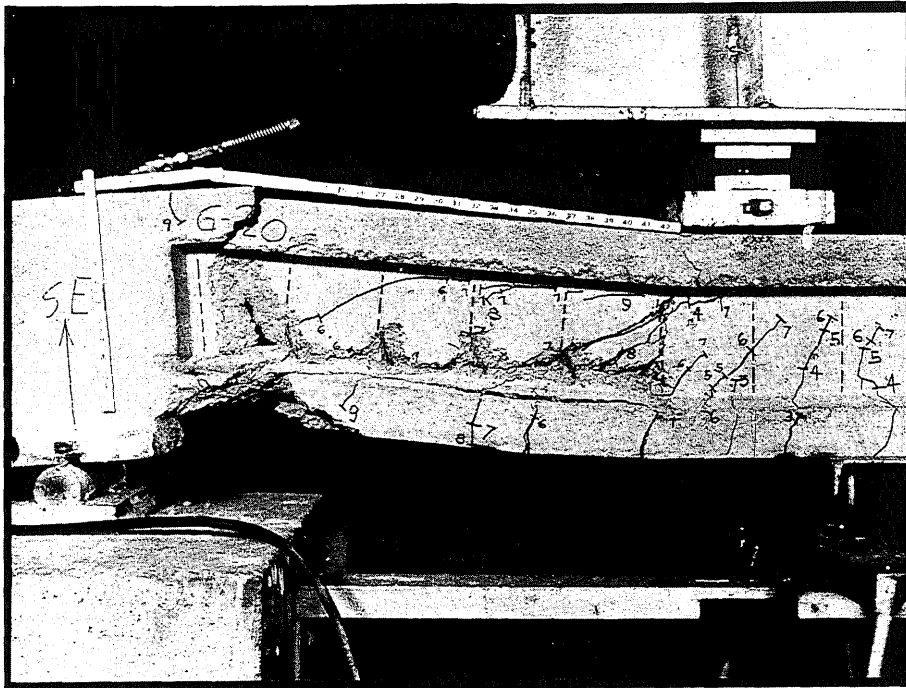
TYPICAL FAILURE BY CRUSHING OF THE WEB
